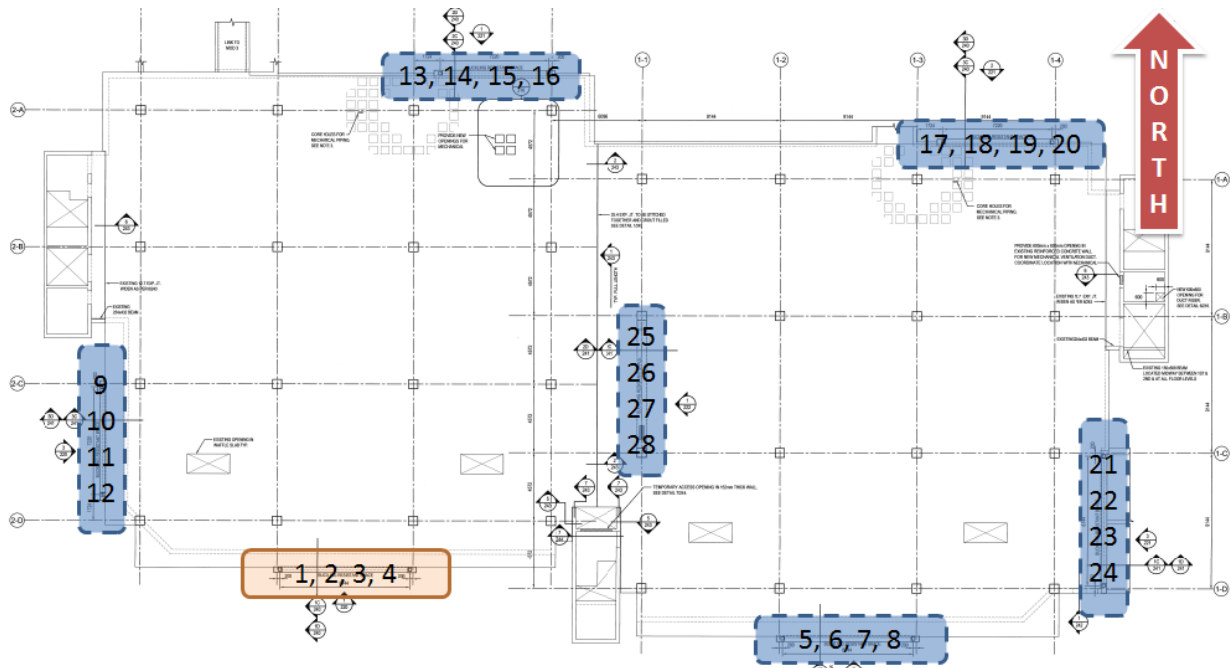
Plan view of modules 1&2 with BRBs highlighted (Structural Drawings, 2010)
